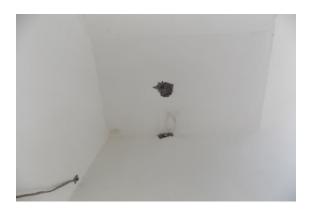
Peeling of Plaster on Roof of of House No. 758, First Floor
